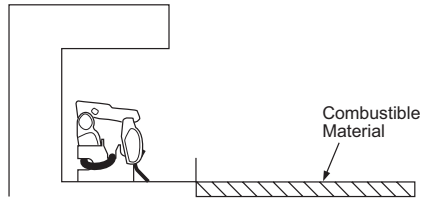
Minimum Fireplace Clearances If Installed at Floor Level
